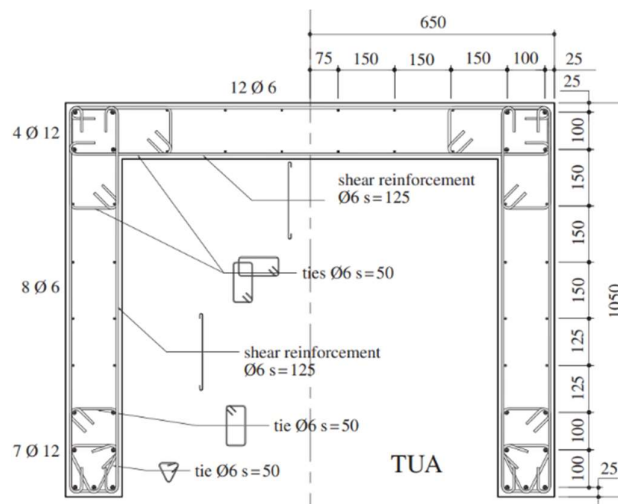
Cross section of the test specimen TUA scale 1:2. Dimensions in mm.(Beyer et al., 2008b)
